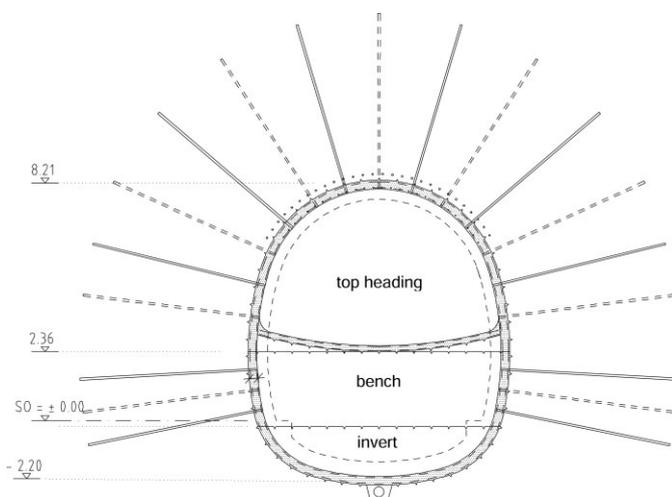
Single-track railway tunnel with top-heading/bench/invert advance with temporary invert and staged full-face excavation
